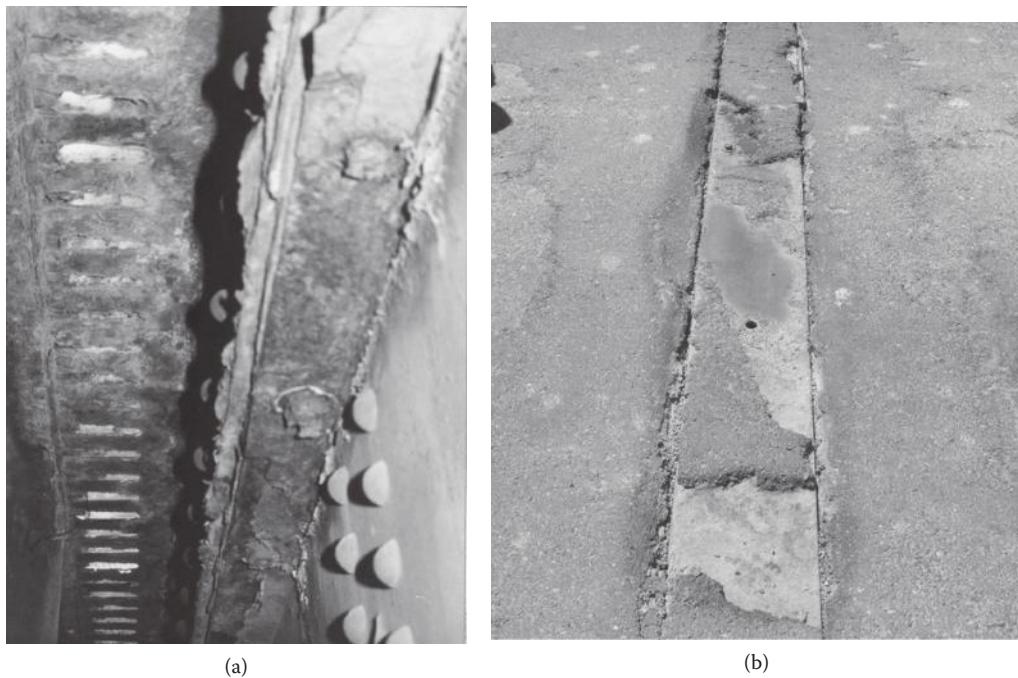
Deterioration at expansion joints: (a) steel bridge joint, (b) concrete bridge joint.
